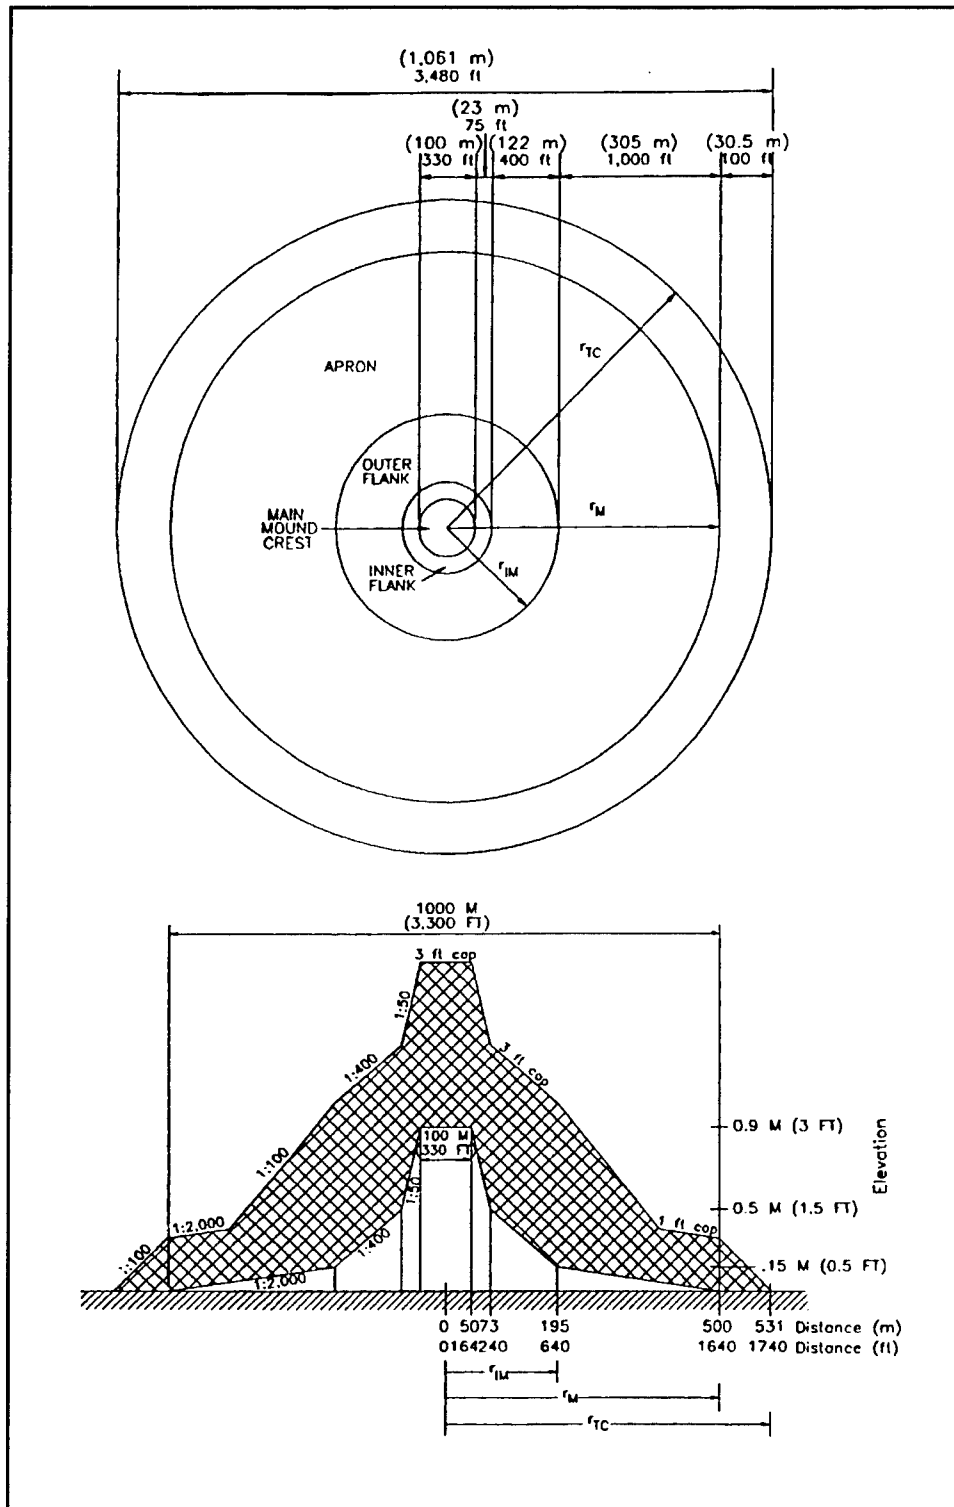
Geometry for a uniform cap with lesser thickness over apron
